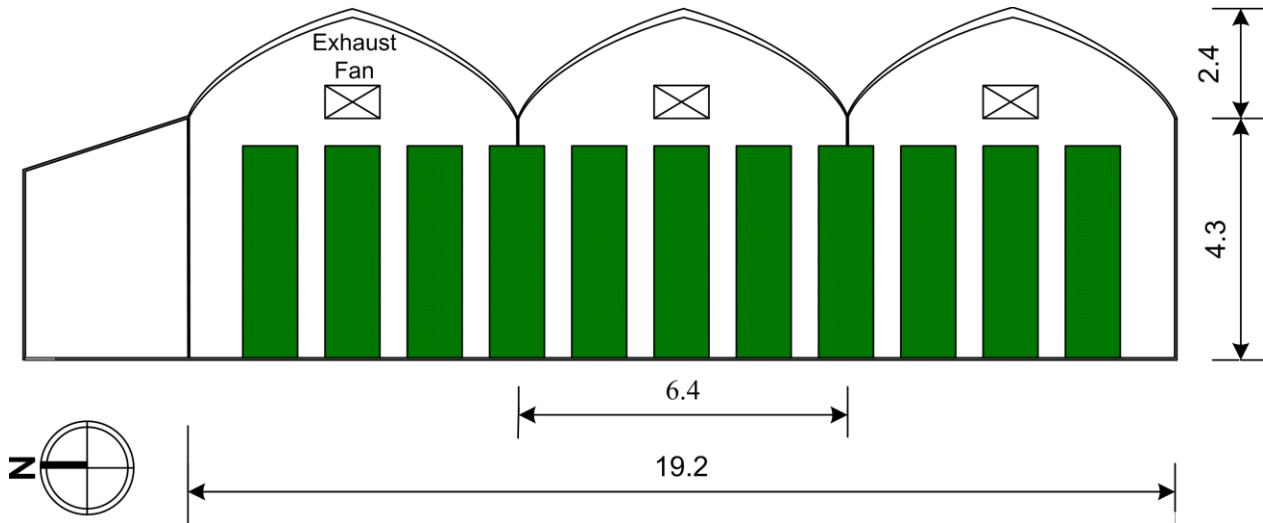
Sketch of the greenhouse cross section (dimensions in m).
